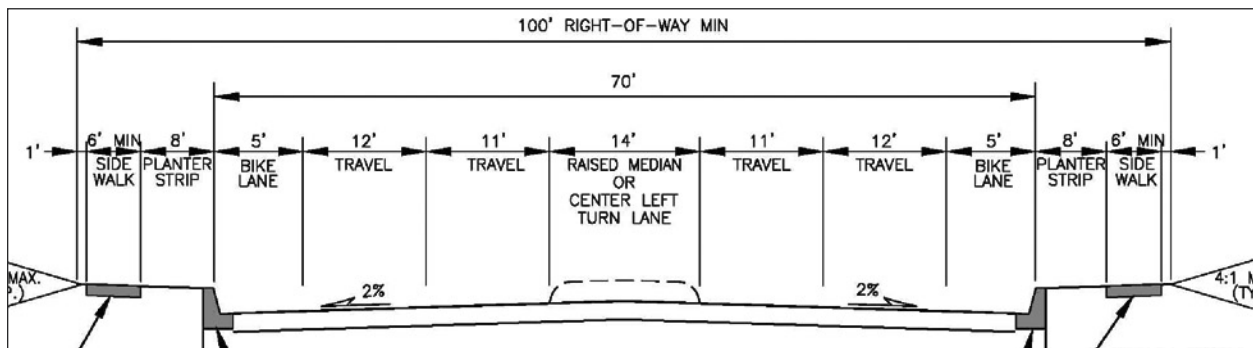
Vancouver's principal arterial standard includes 100 feet of right-of-way, 11 and 12 foot travel lanes, a 14 center turn lane, bike lanes and detached sidewalks.
